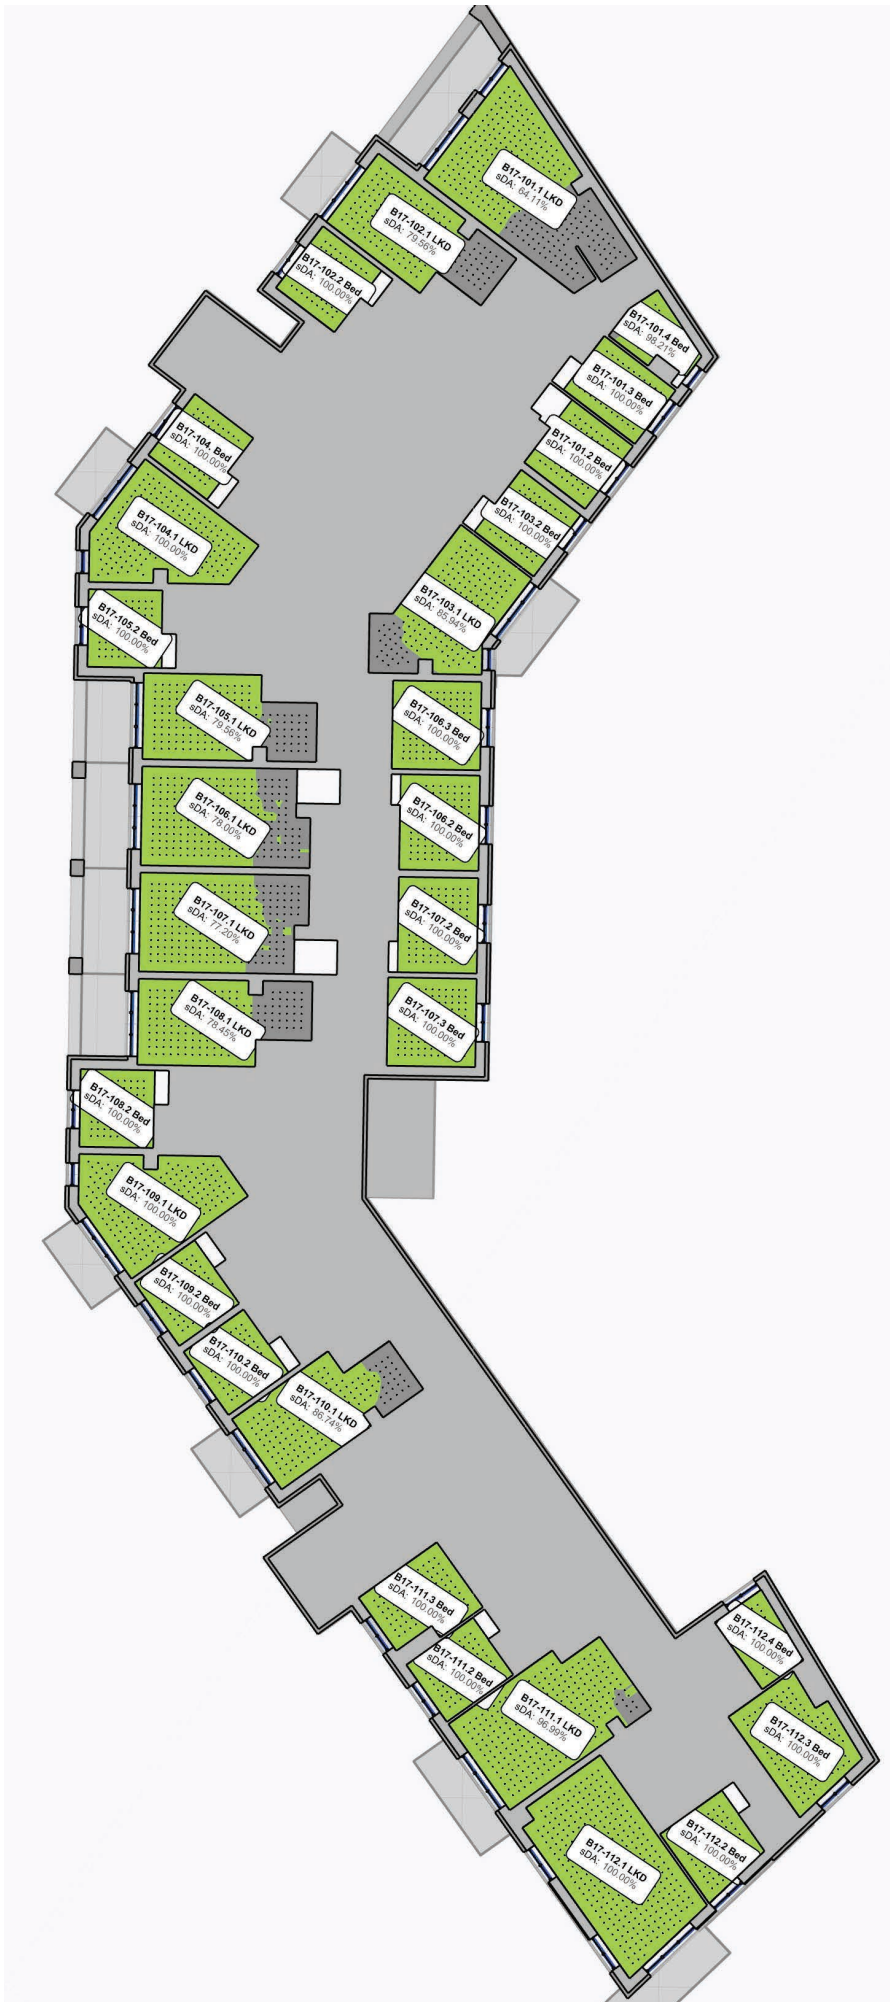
Site 17 - Floor plans indicating Daylight Provision to BS EN17037:2021+A1 Table NA.1
